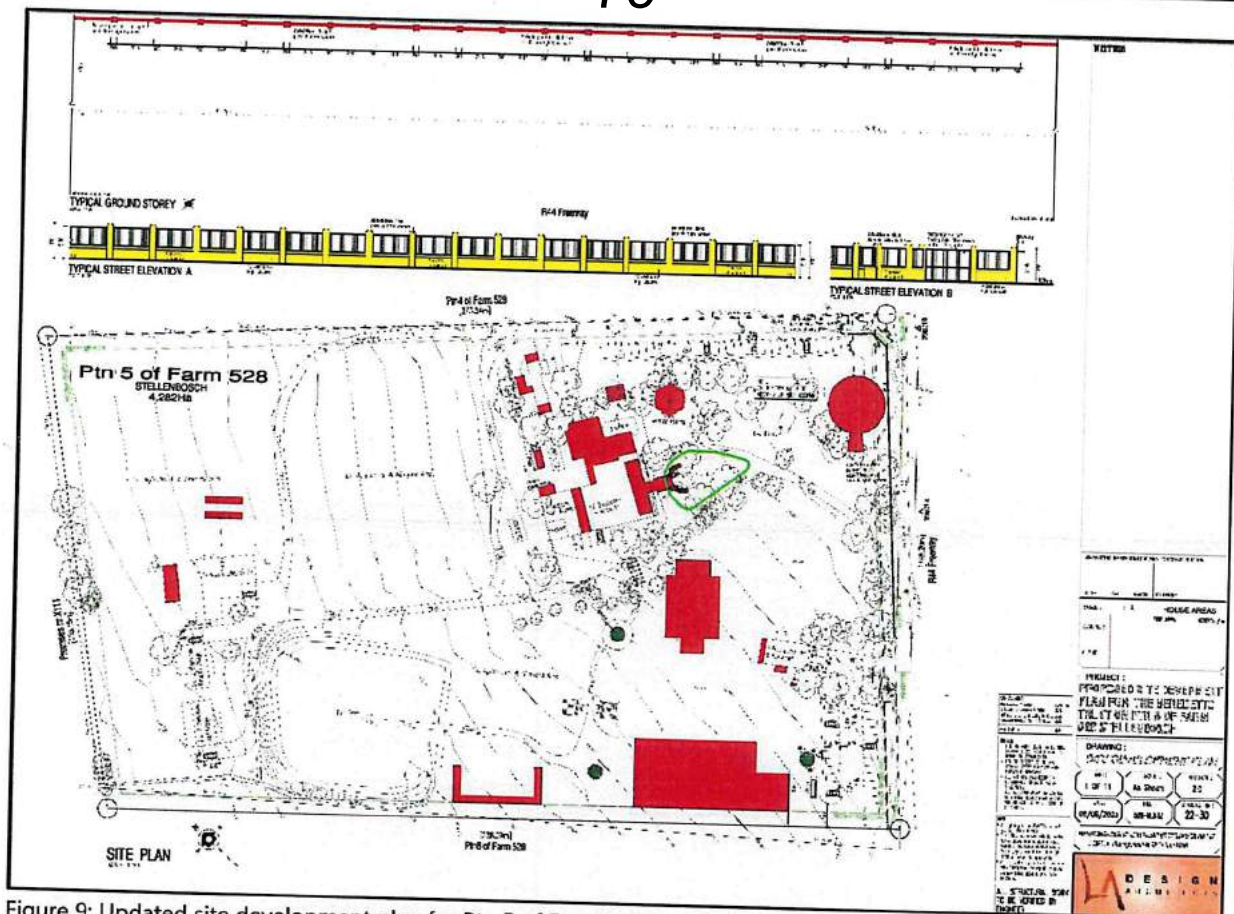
Updated site development plan for Ptn 5 of Farm 528
